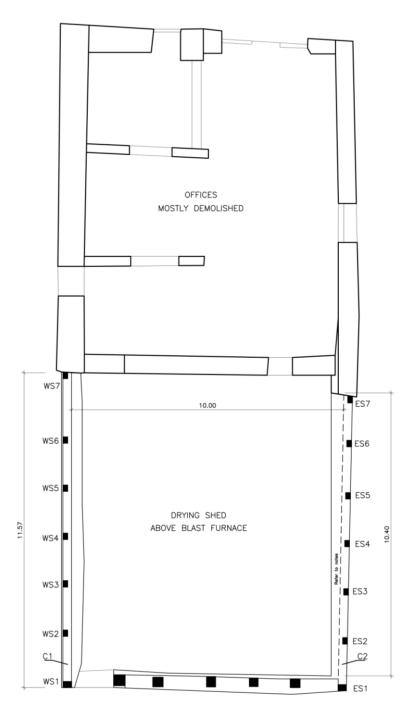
This is the construction of the timber frame over the blast furnace in c.1740 [27]. The sill plate on the east side has almost disappeared because of decay. ESY stands for East Wall Stud "Y"; WSX stand for west wall Stud "X", C1 West sill plate and C2 East sill plate.
